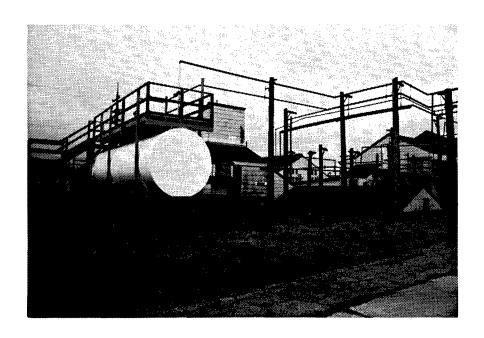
Building 4501: Alcohol Pump and Accumulator House.
